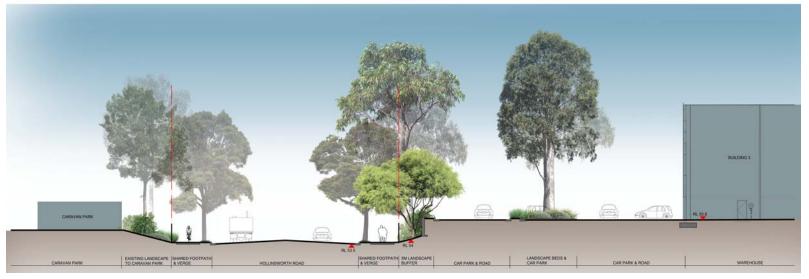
SECTION THROUGH THE NORTHERN HOLLINSWORTH ROAD BUFFER (BUILDING 3)
